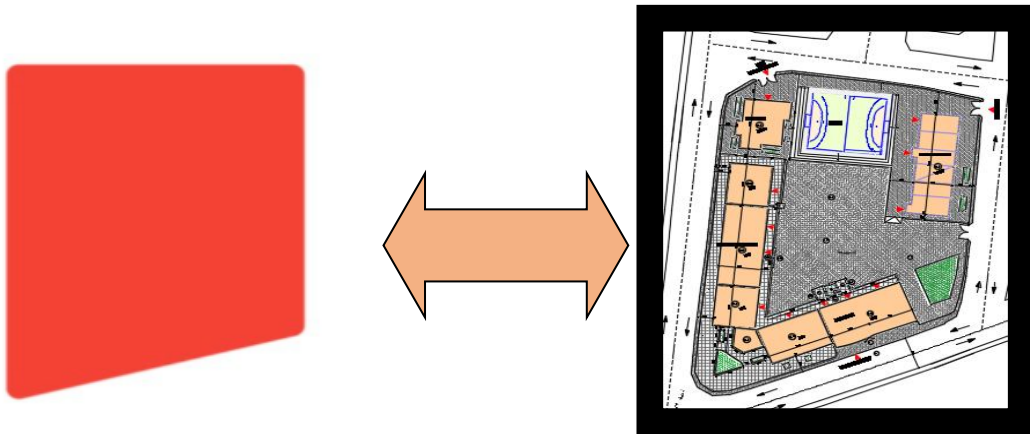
building shape shape ,Source: massing plan adapted by the author 2025
